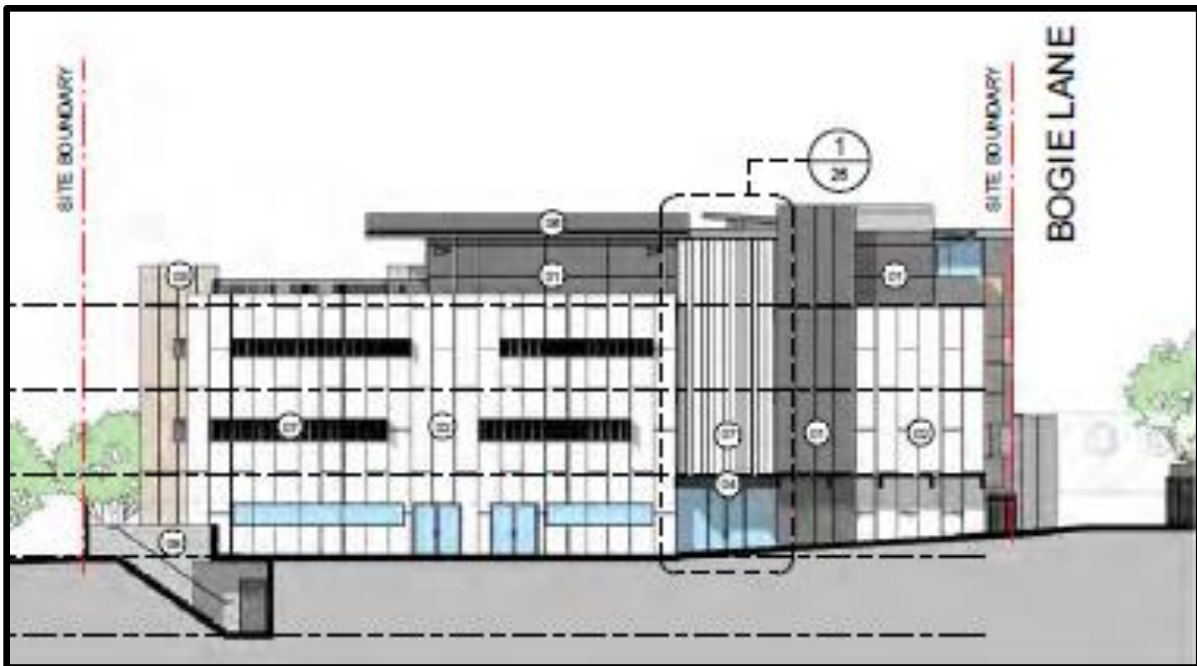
Northern elevation of the proposed new building located along Woids Avenue Allawah as originally proposed
